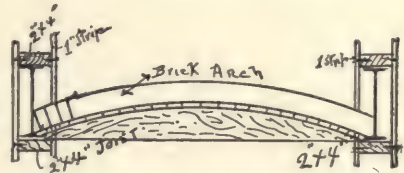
Method of Setting Centers for a Brick Arch Floor.
